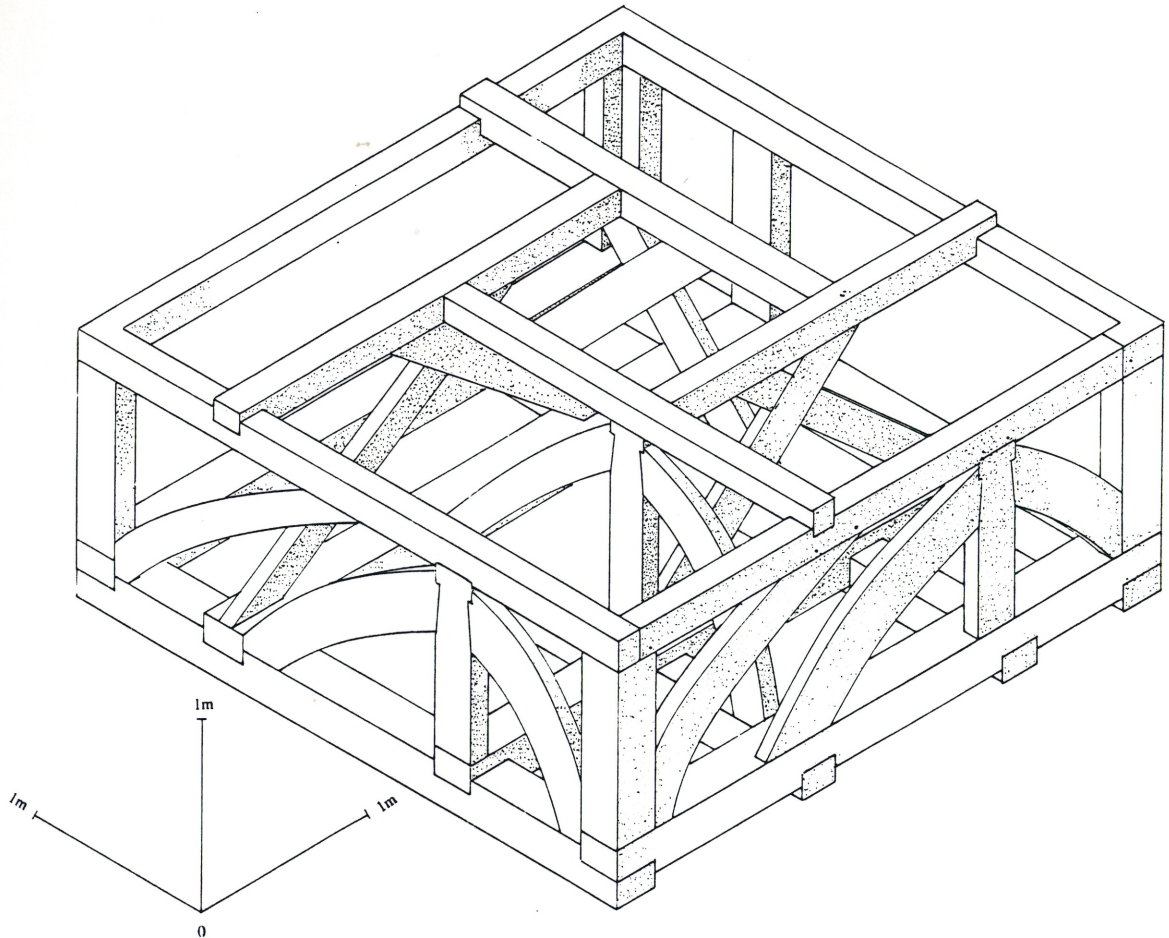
Isometric plan of bell frame (Drawing by A. Baggs)
